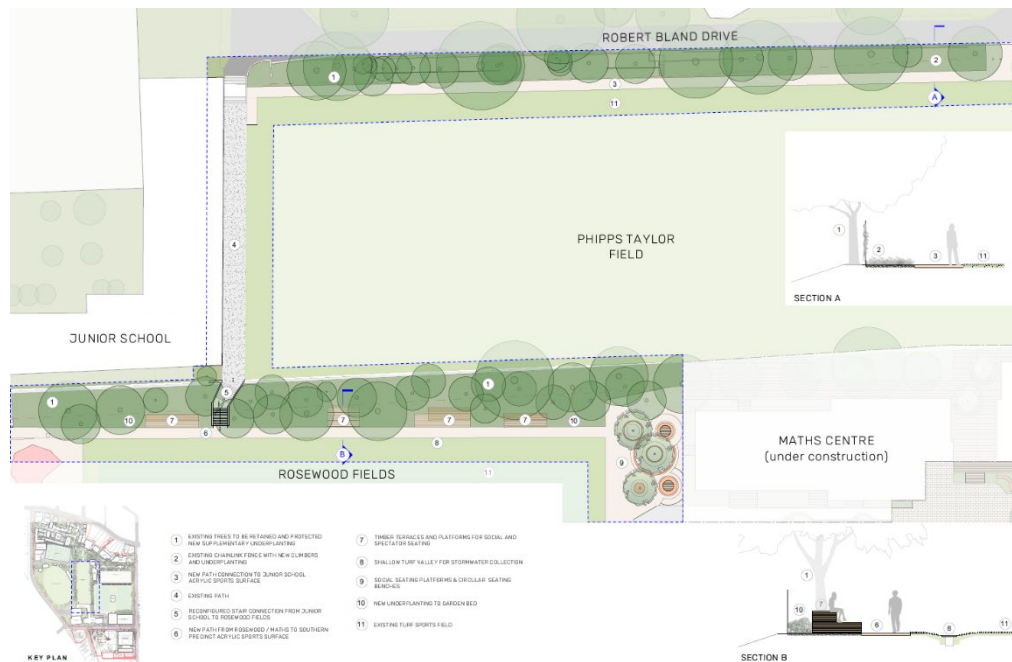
Proposed landscape works surrounding the Phipps Taylor Field. (Source: 360 Degrees Landscape Architecture)
